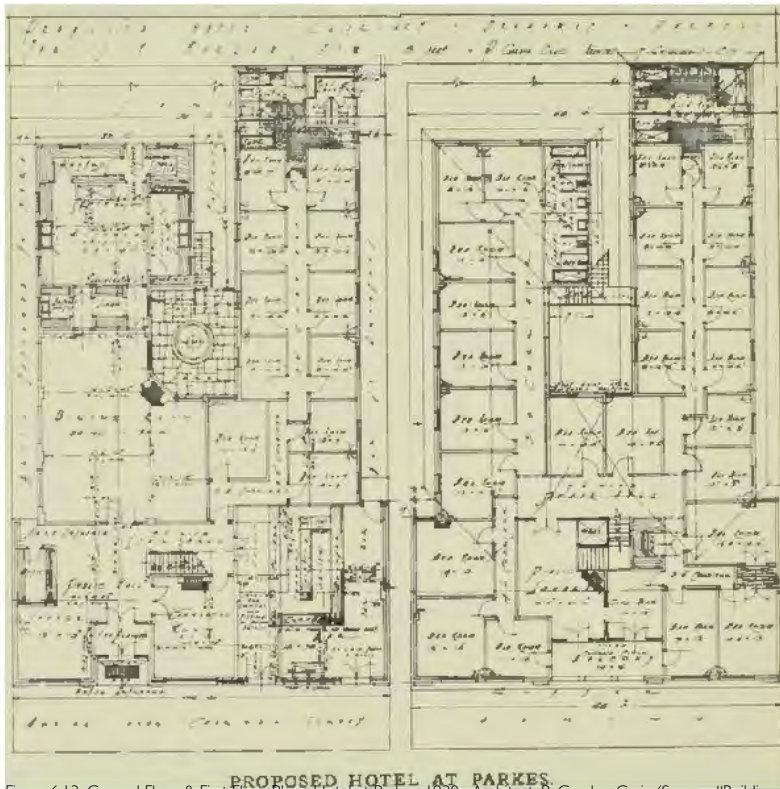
Ground Floor & First Floor Plans, Hotel at Parkes, 1930. Architect: P. Gordon Craig (Source: "Building Australia", *Building*, 12 March 1930, p.46)
